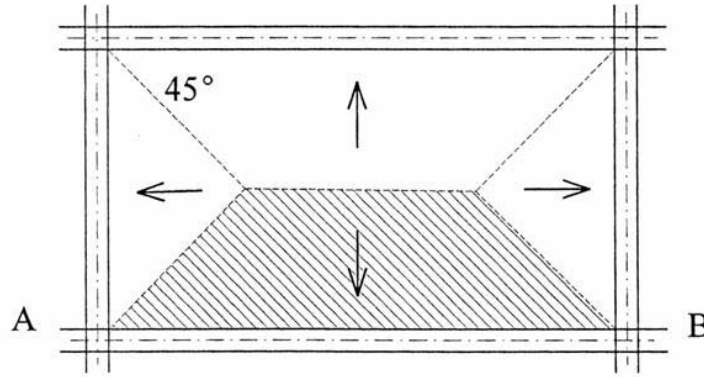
Supporting beams' contributing areas for reinforced concrete floor system.
